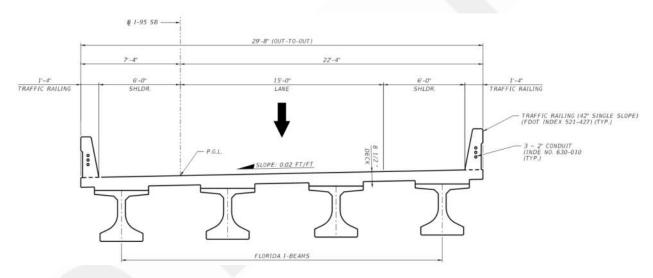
Bridge Typical Section (Bridge No. 16)
